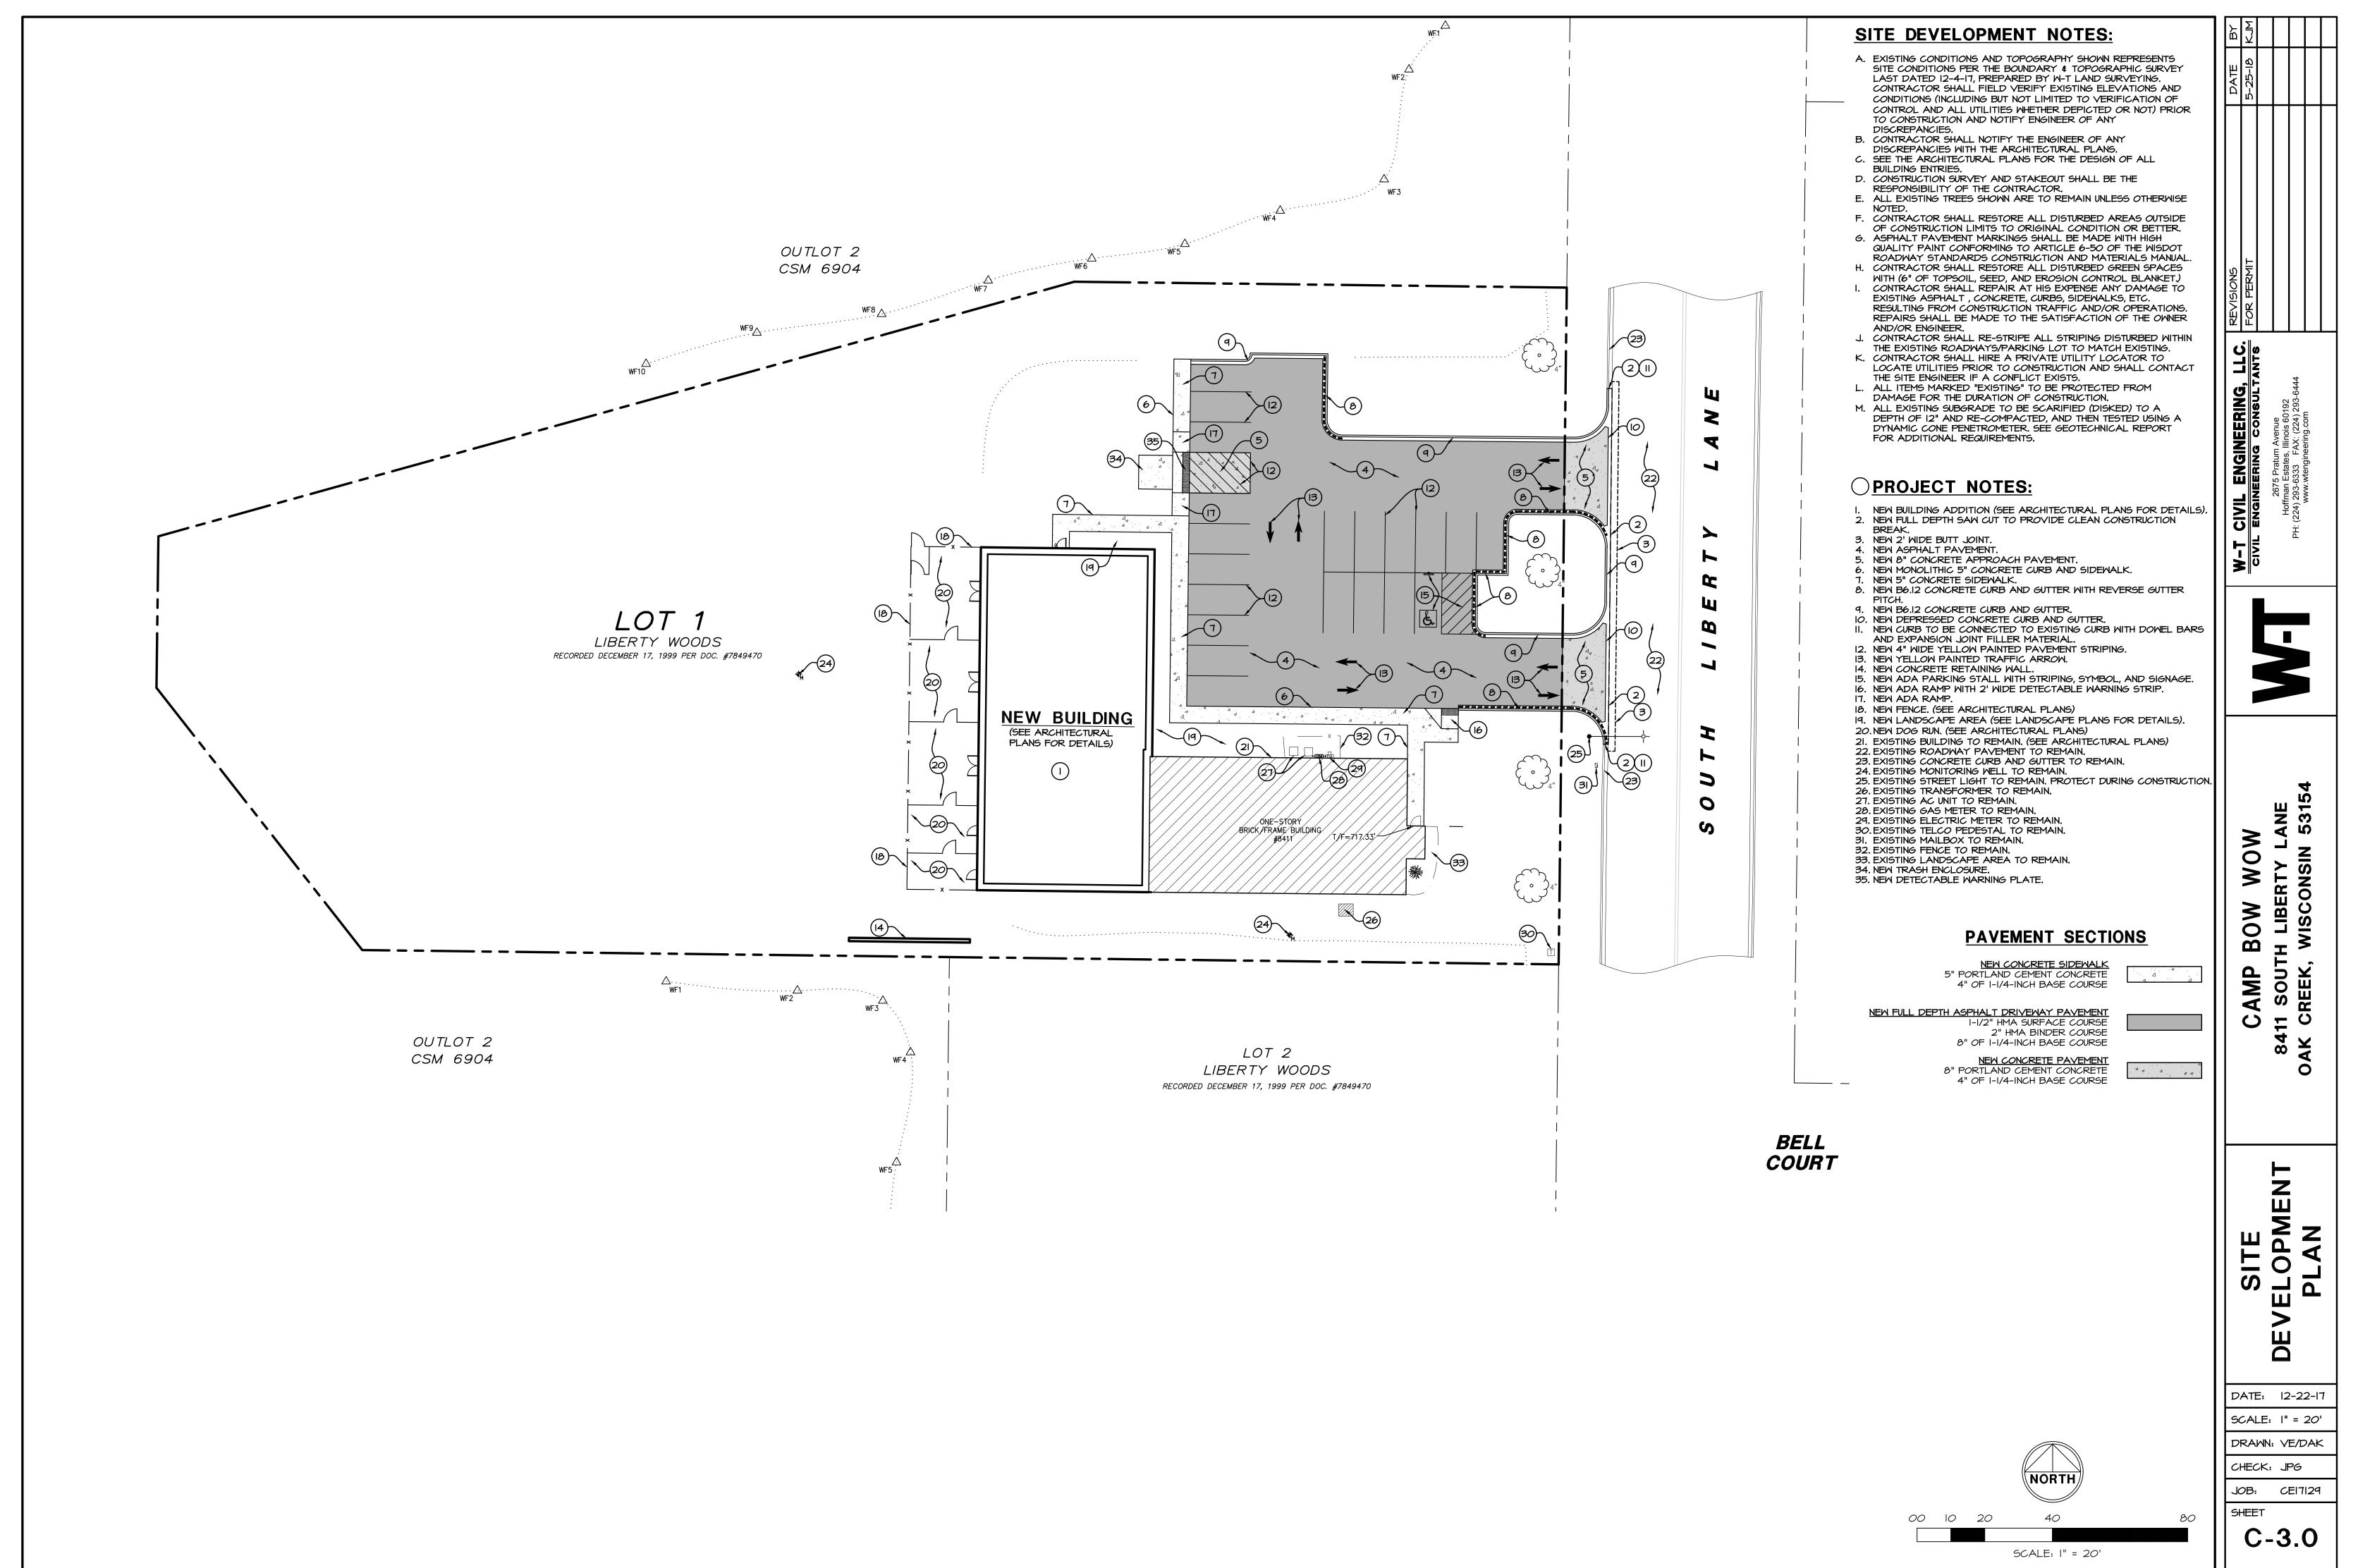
EXHIBIT A: CONCEPT SITE PLAN (ENLARGED)
